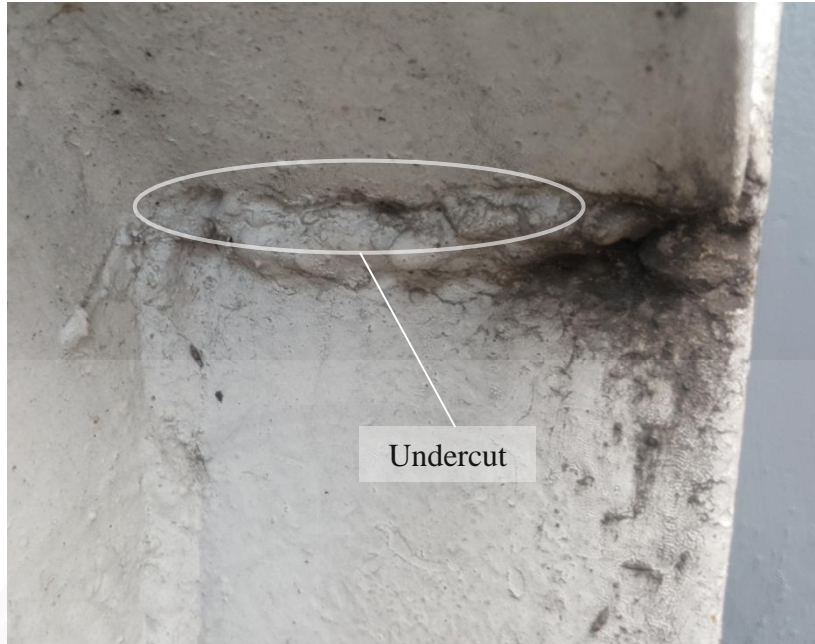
Welding defects on Steel Structure B (joint 3)
